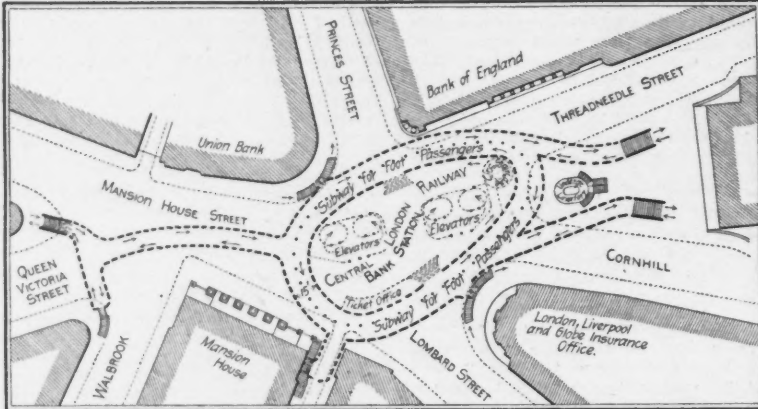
PLAN OF THE UNDERGROUND STATION AT THE BANK OF ENGLAND, SHOWING STAIRWAYS AND ELEVATOR SHAFTS.
